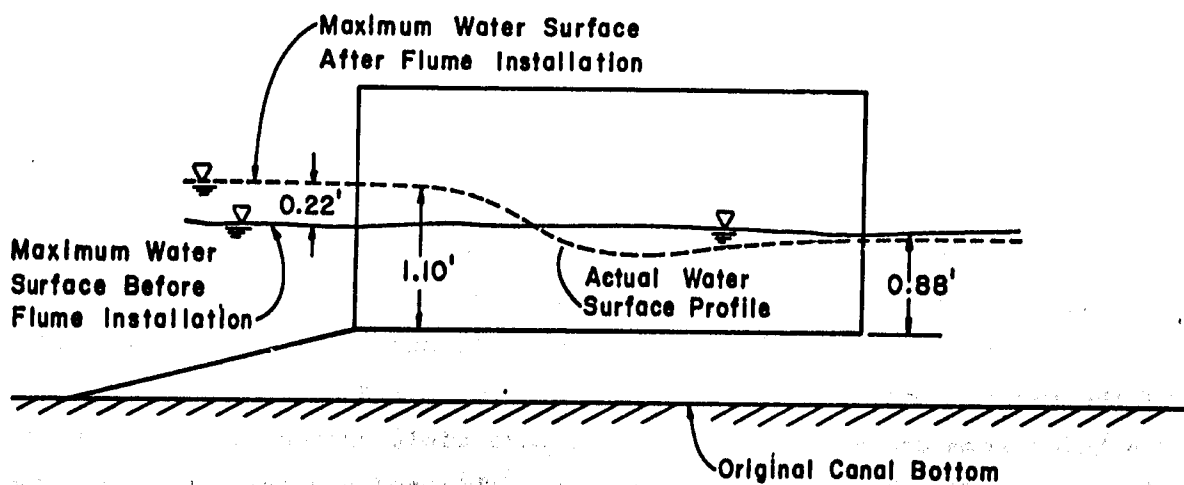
Installation of 3-foot throat width and 9-foot length Cutthroat flume.
